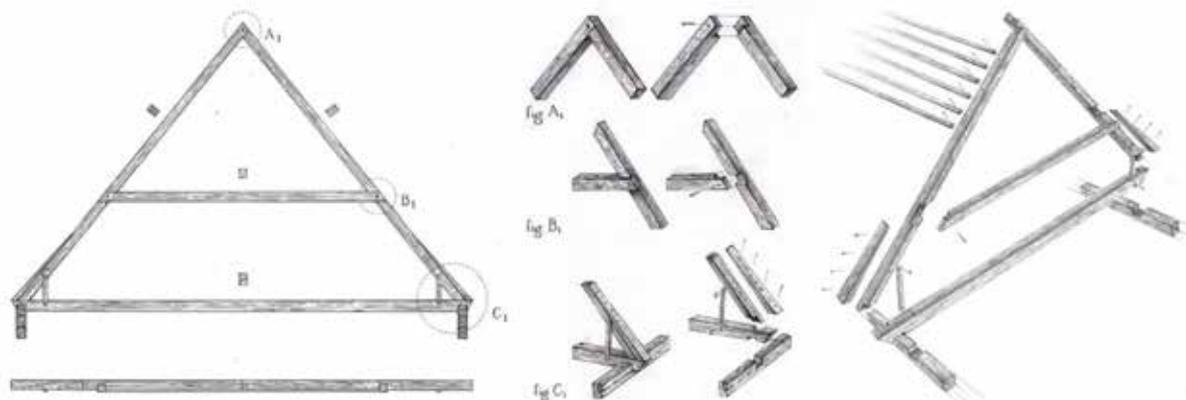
Technological analysis of the truss; Special structural nodes a₁-“strut-strut” connection, b₁-“king post-strut” connection, c₁-“strut-chain” connection; Perspective explosion of the truss.
